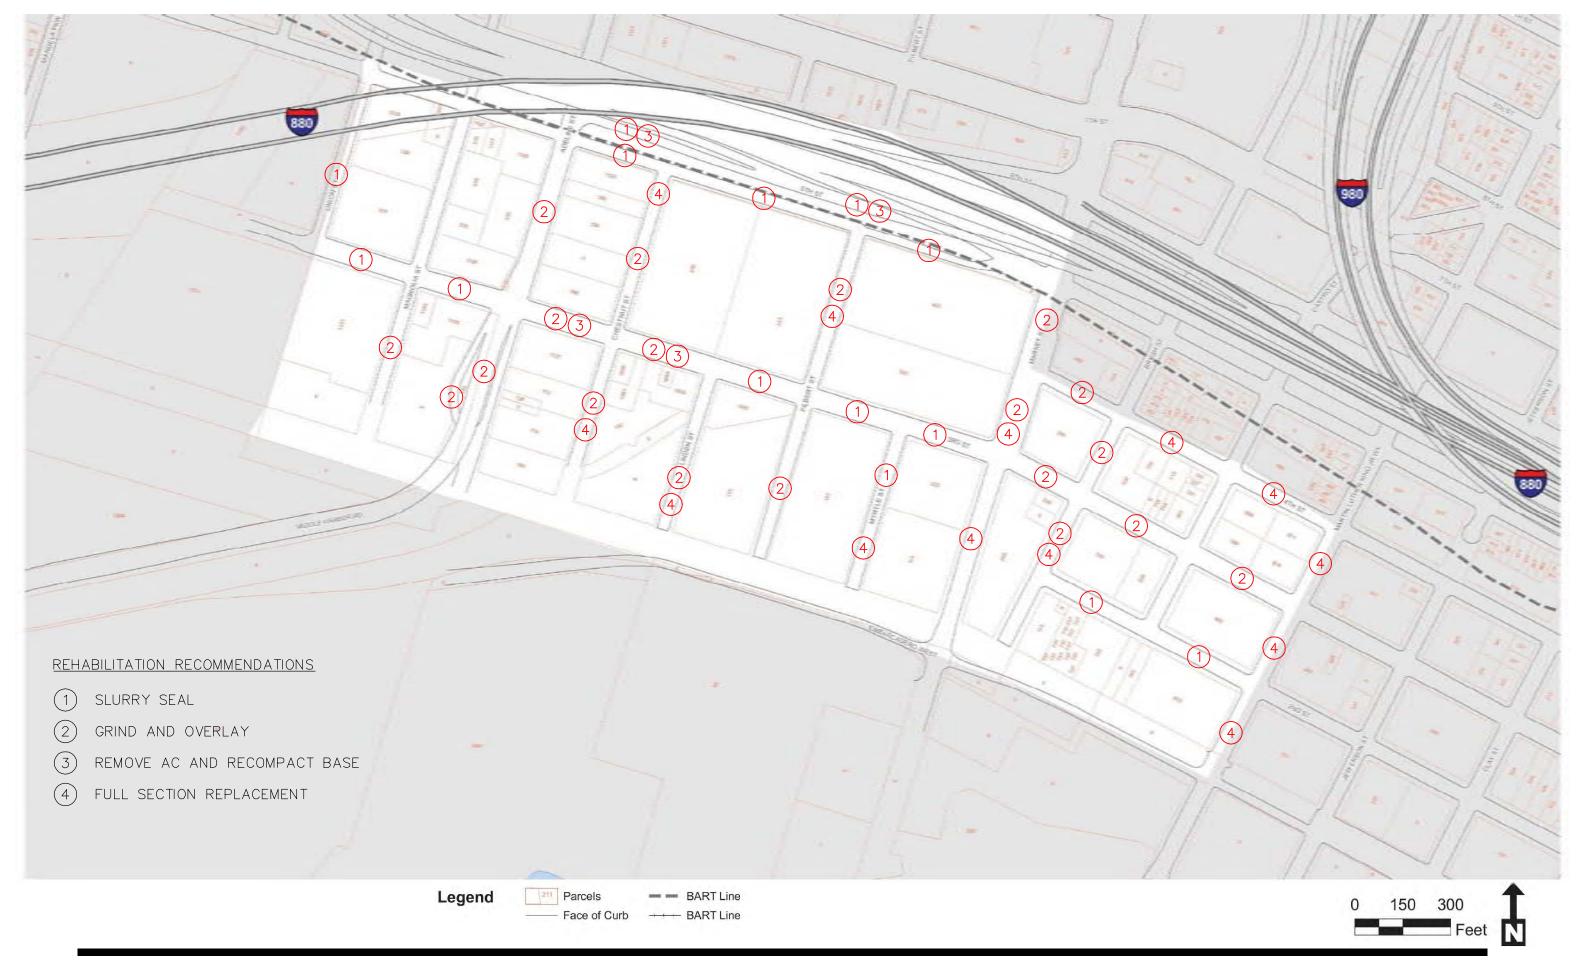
3RD STREET ZONE PAVEMENT REHABILITATION RECOMMENDATIONS
